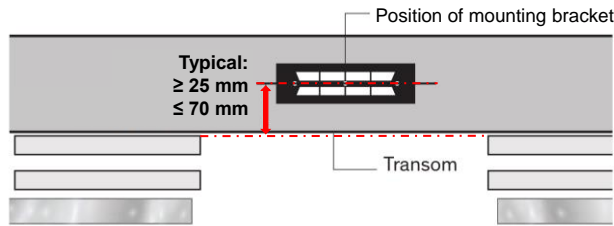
Typical installation distance CabSafe 3D sensor to the front of the cabin door (top view)
